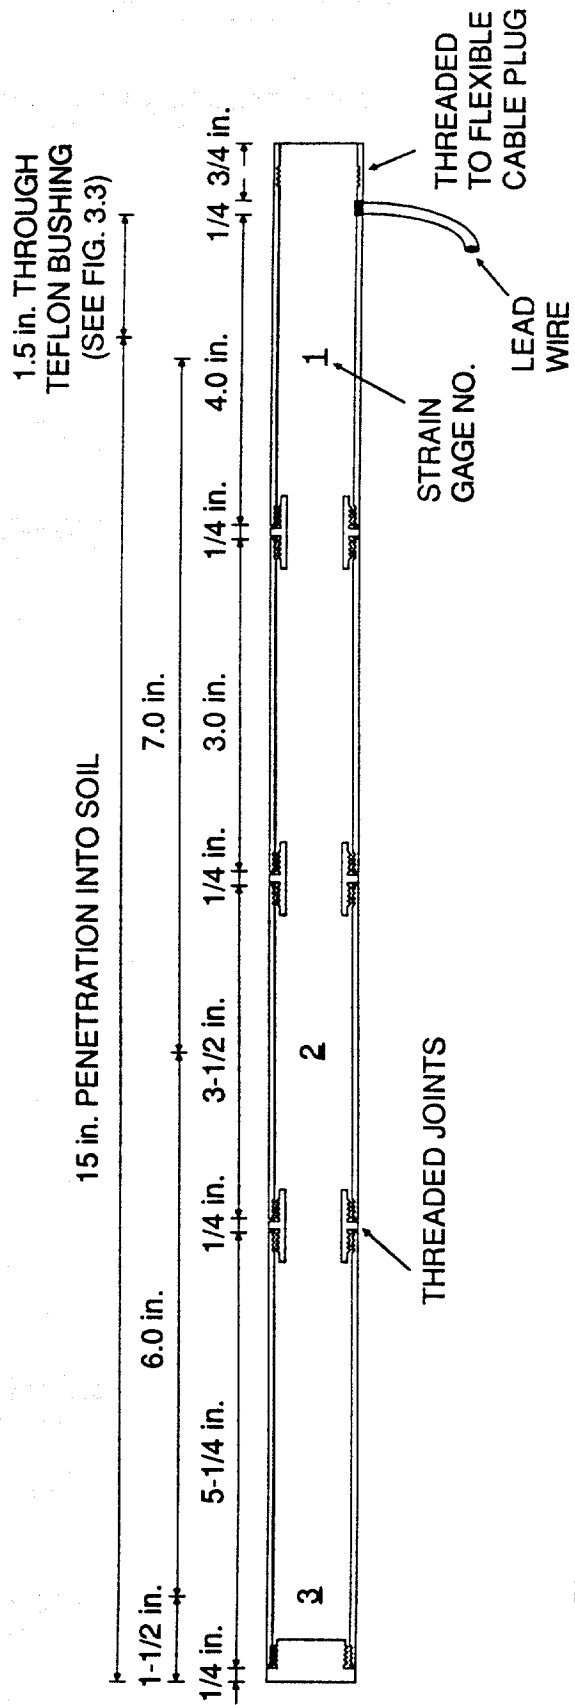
Longitudinal Cross-Sectional View of Test Pile
